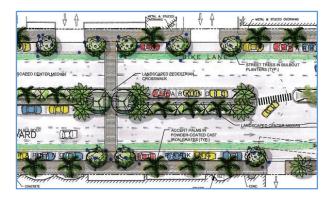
Proposed Hollywood Blvd. Demonstration Project (In Design)
